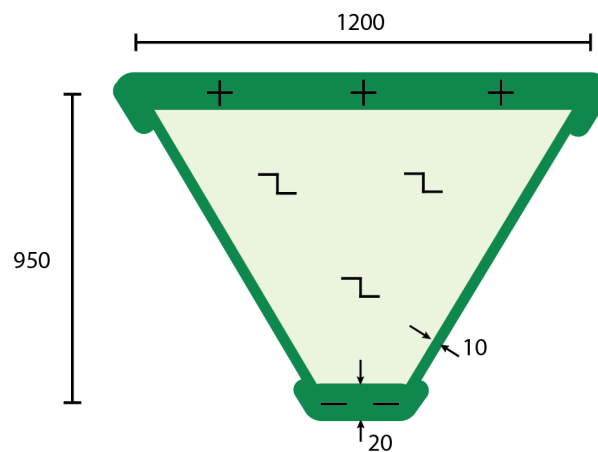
Cross-section of pedestrian bridge Eindhoven [mm]
